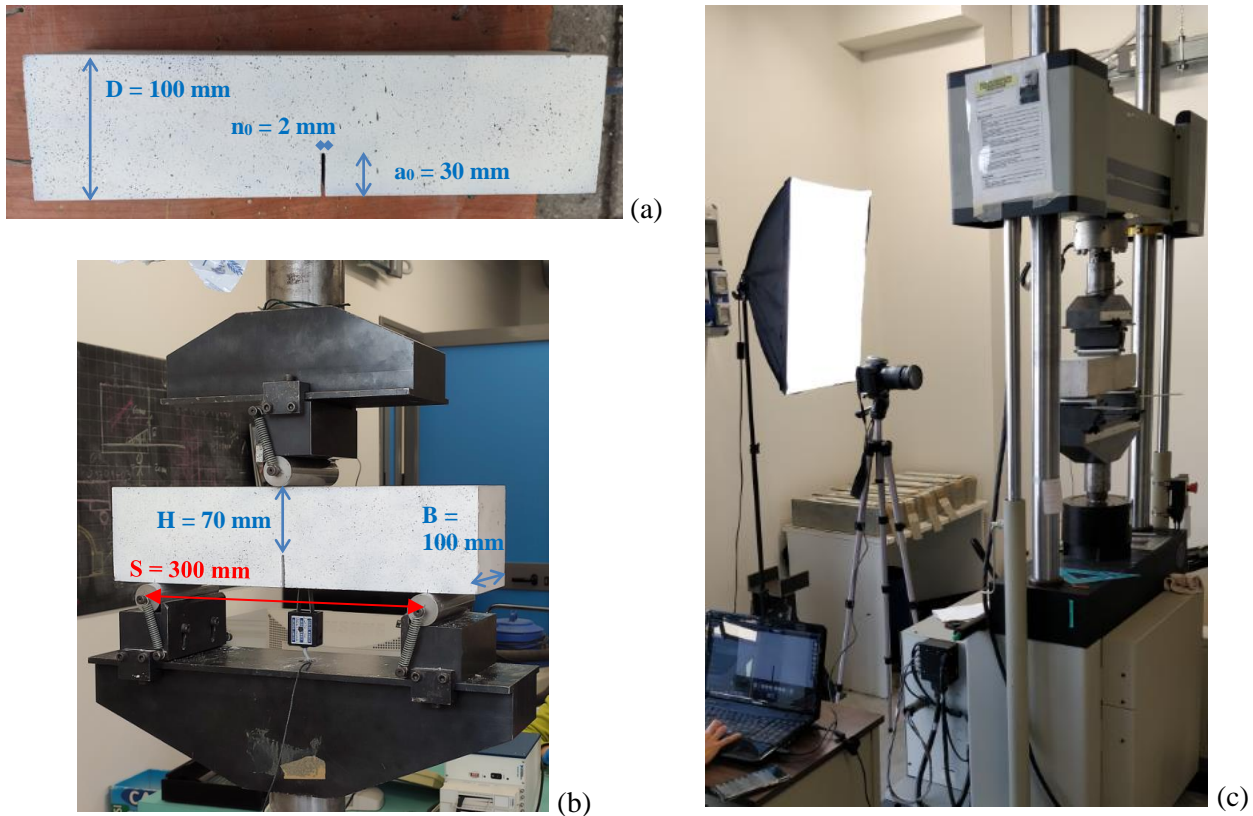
(a) Prismatic specimen prepared for three-point bending test (3PBT) and DIC; (b) notched beam placed on the Universal Testing Machine: loading set-up with the clip-on gauge across the notch; (c) 3PBT and DIC set-up.
